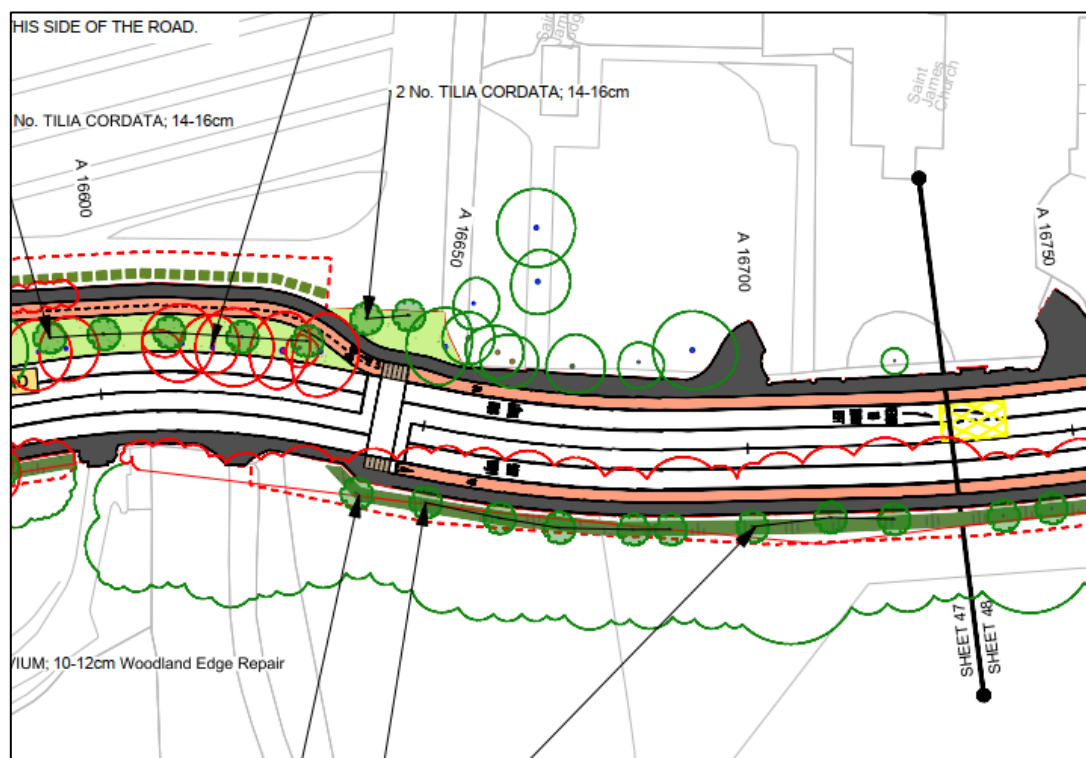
Extract from Landscape Drawings at Beauchamp House (Sheet 47)
